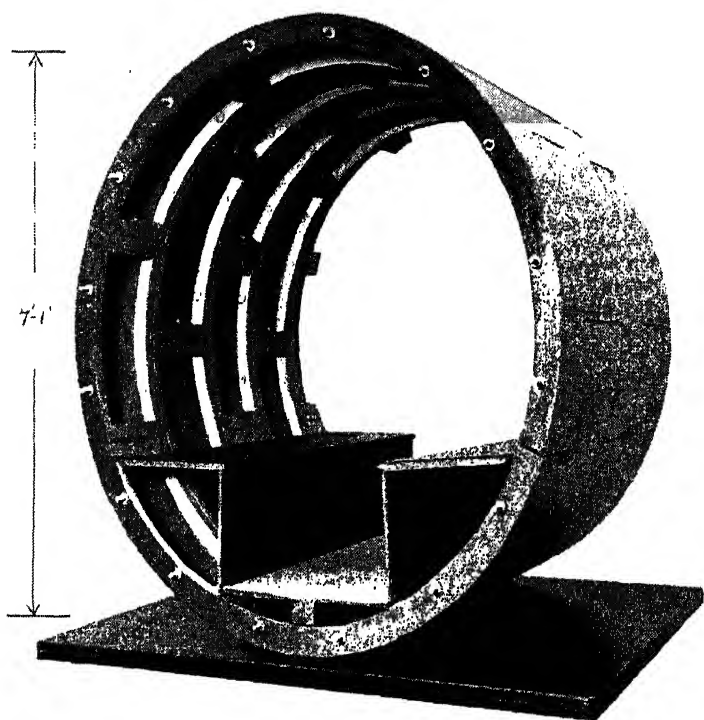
Photographic model of a Shoccrete-segment tunnel.
